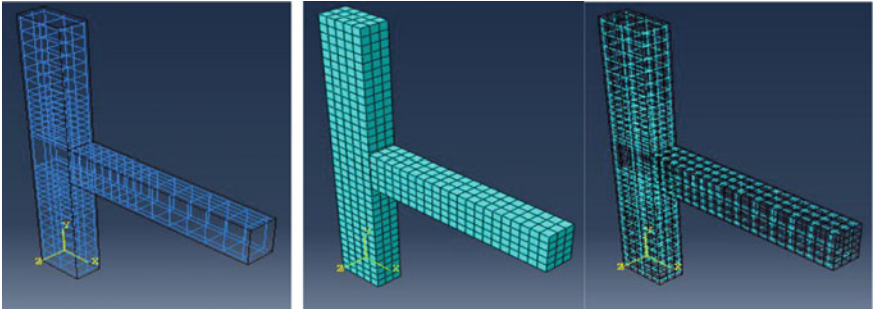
Reinforcement layout and meshing of concrete and steel reinforcement
